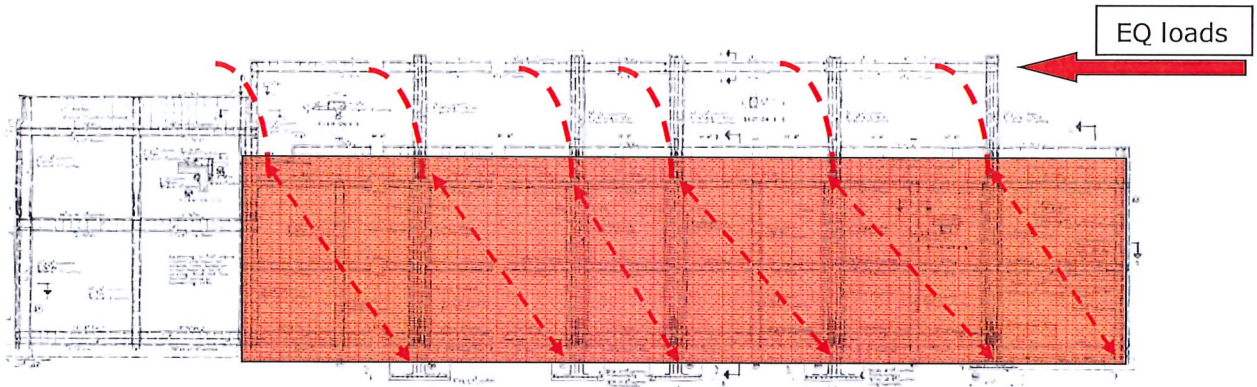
Schematic of Longitudinal Load path through Town Hall Side Walls
